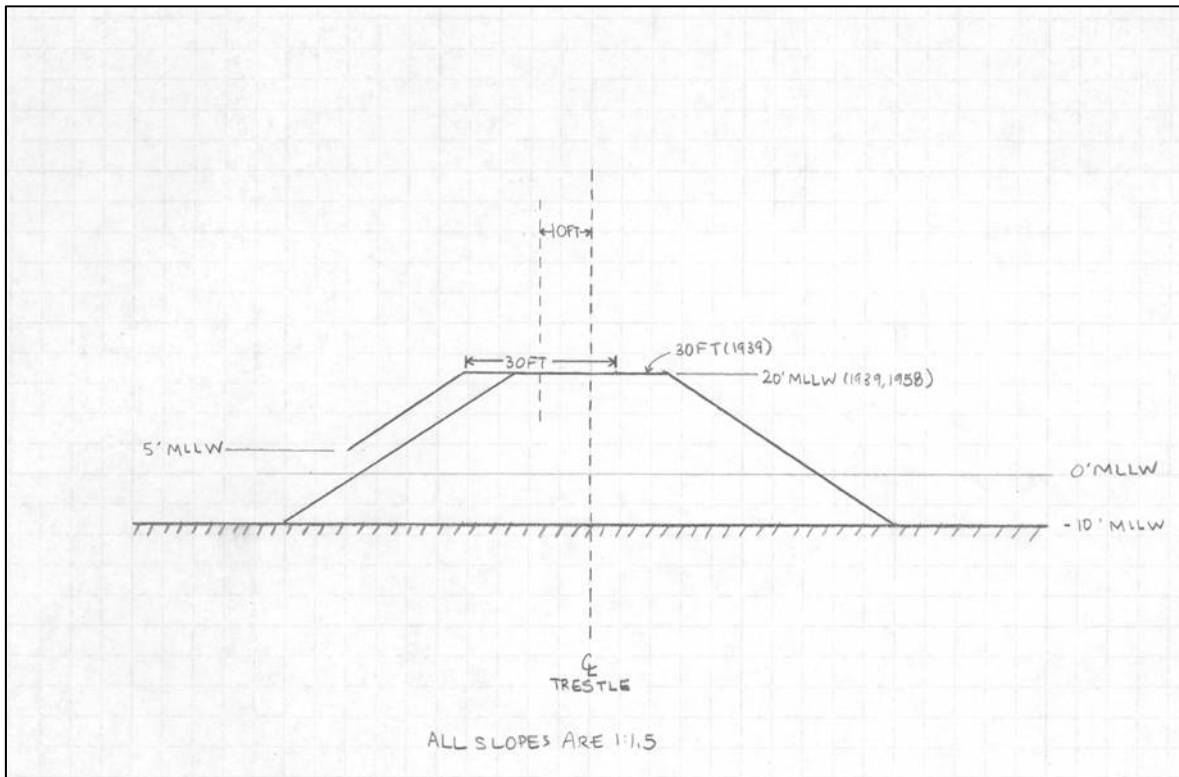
150. Jetty A Cross Section Templates - 68 to 76+50 - Trunk
